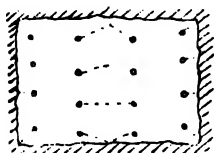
Face of Stone Drift showing the arrangement of Shot-holes
